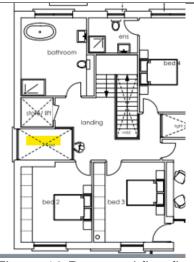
Proposed first floor plan showing void area where the double height glazing is highlighted in yellow.
